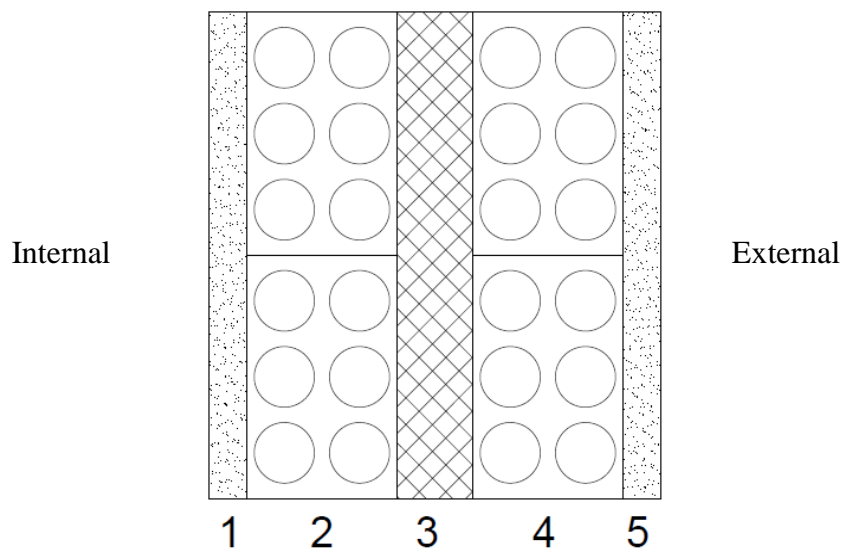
Typical topology detail of a double wall with insulation in-between without air gap
